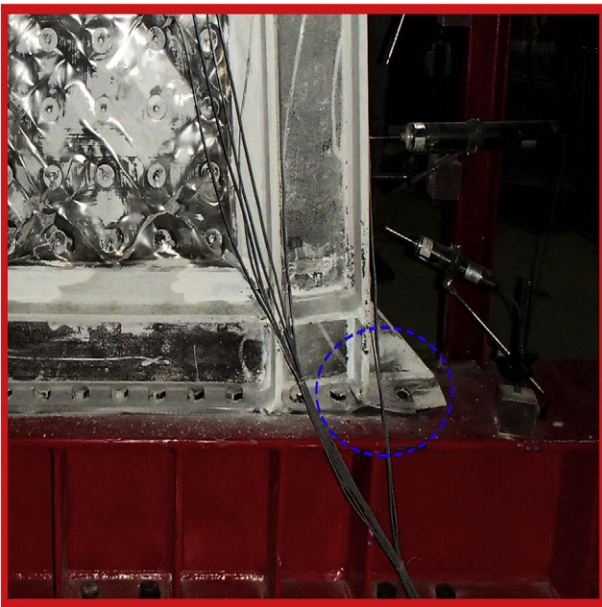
The fracture of base beam bolt and the failure of connection between left column and base plate.
